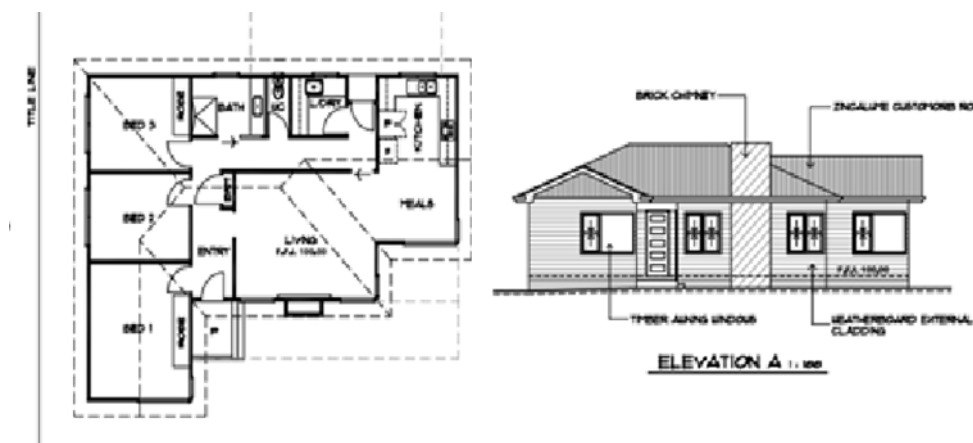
Existing Dwelling Floor Plan and Front Elevation
